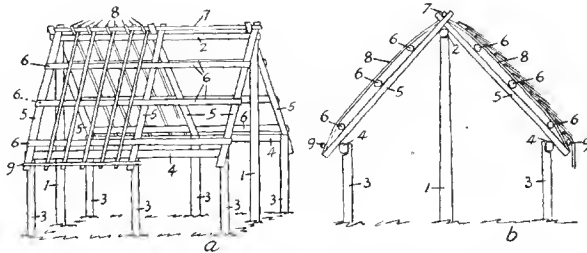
Rectangular section of cooking house (*to sunu'i* type): *a*, side view; *b*, end view: 1, supporting posts (*poutu*) 10 to 12 feet high planted in the ground 8 to 10 feet apart; 2, ridgepole (*'au'au*); 3, wall posts (*pou lalo*) 4 to 6 feet high, sunk into the ground 5 to 6 feet from the supporting posts, their tops forked naturally or artificially shaped to receive the wall plates; 4, wall plates lashed to the outer side of the wall posts; 5, rafters crossed at their upper ends; 6, purlins; 7, upper ridgepole (*'au'au lunga*); 8, thatch rafters (*'aso*); 9, eave battens (*langolau*).
